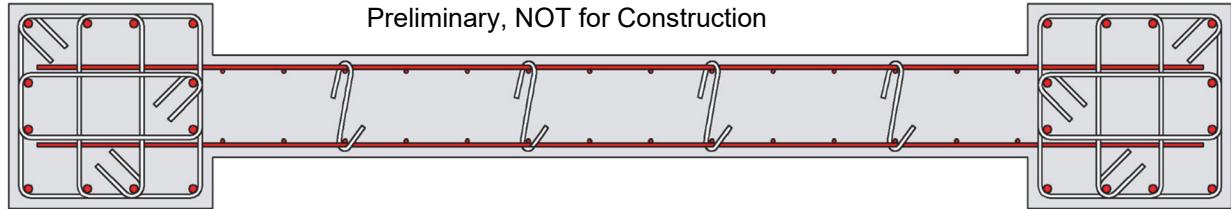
Conceptual plan detail of reinforced concrete shear walls at boundary columns (courtesy of MHP Structural Engineers).
